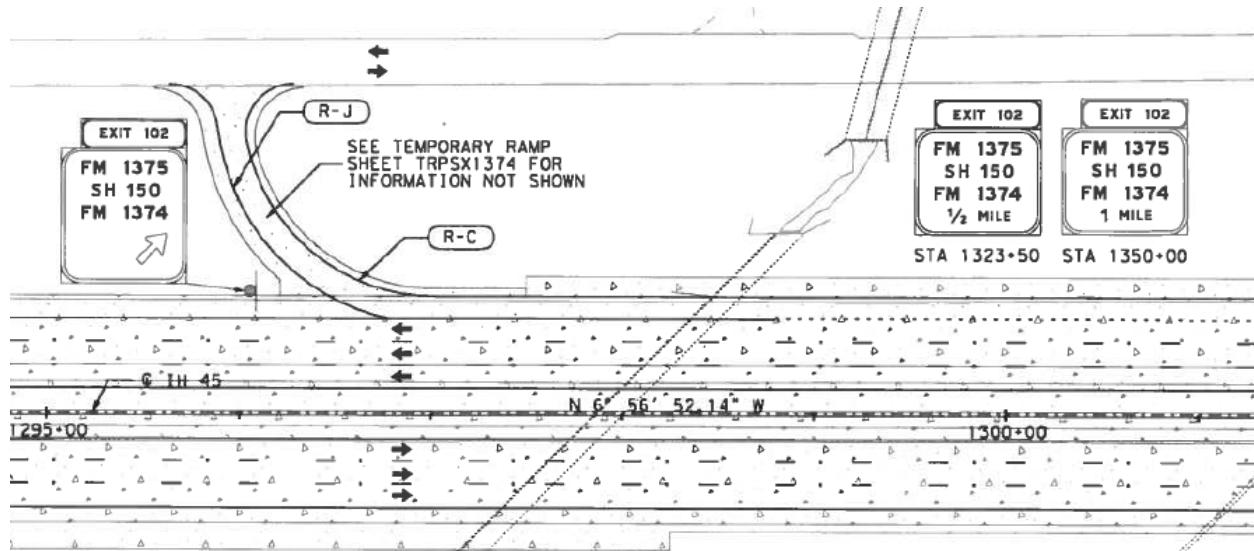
Construction Plans Showing Placement of Exit Direction Sign.
